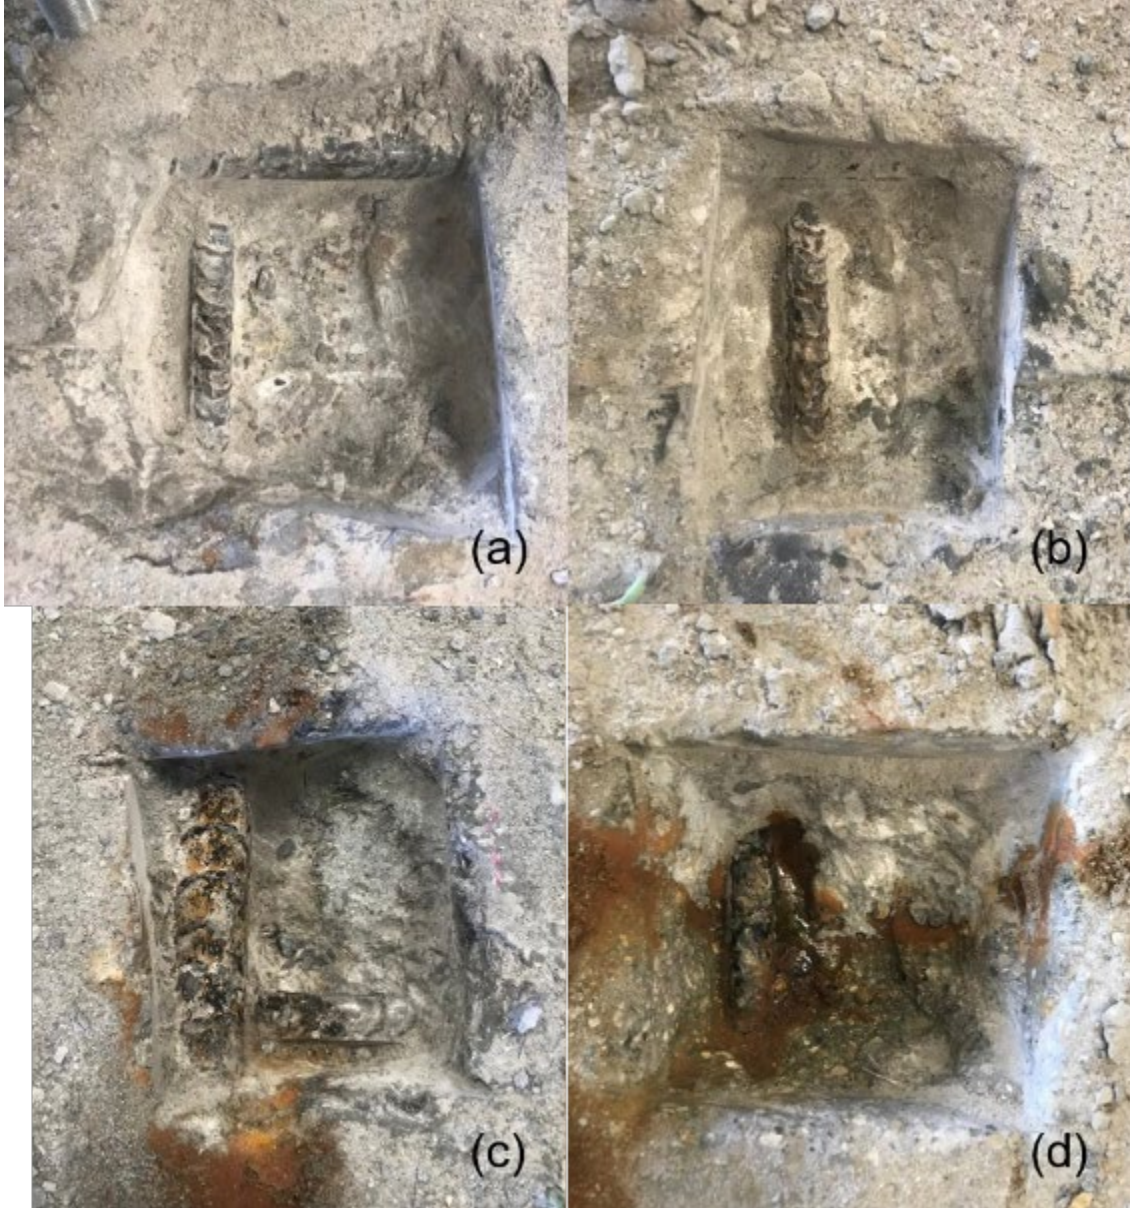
Fifth rebar excavation for large-scale corrosion specimens using (a) ODOT AA, (b) J3, (c) Ductal®, and (d) Phoscrete after 24 hours
